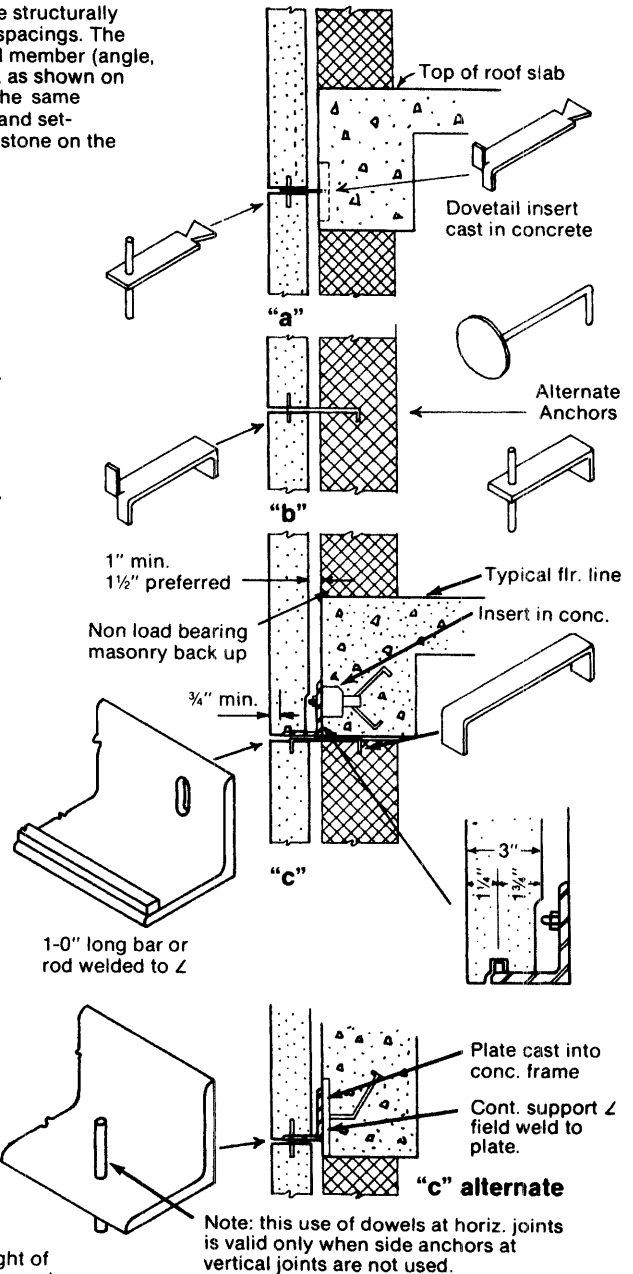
Anchorage of stone panels to multistory building. (Courtesy of Indiana Limestone Institute of America, Inc.)
